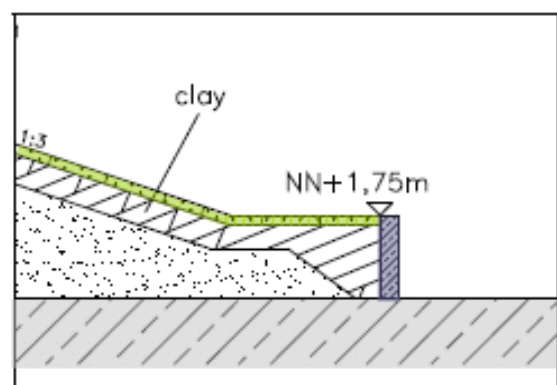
Detail B – Toe protection of the landward slope (see Figure 2.6)
